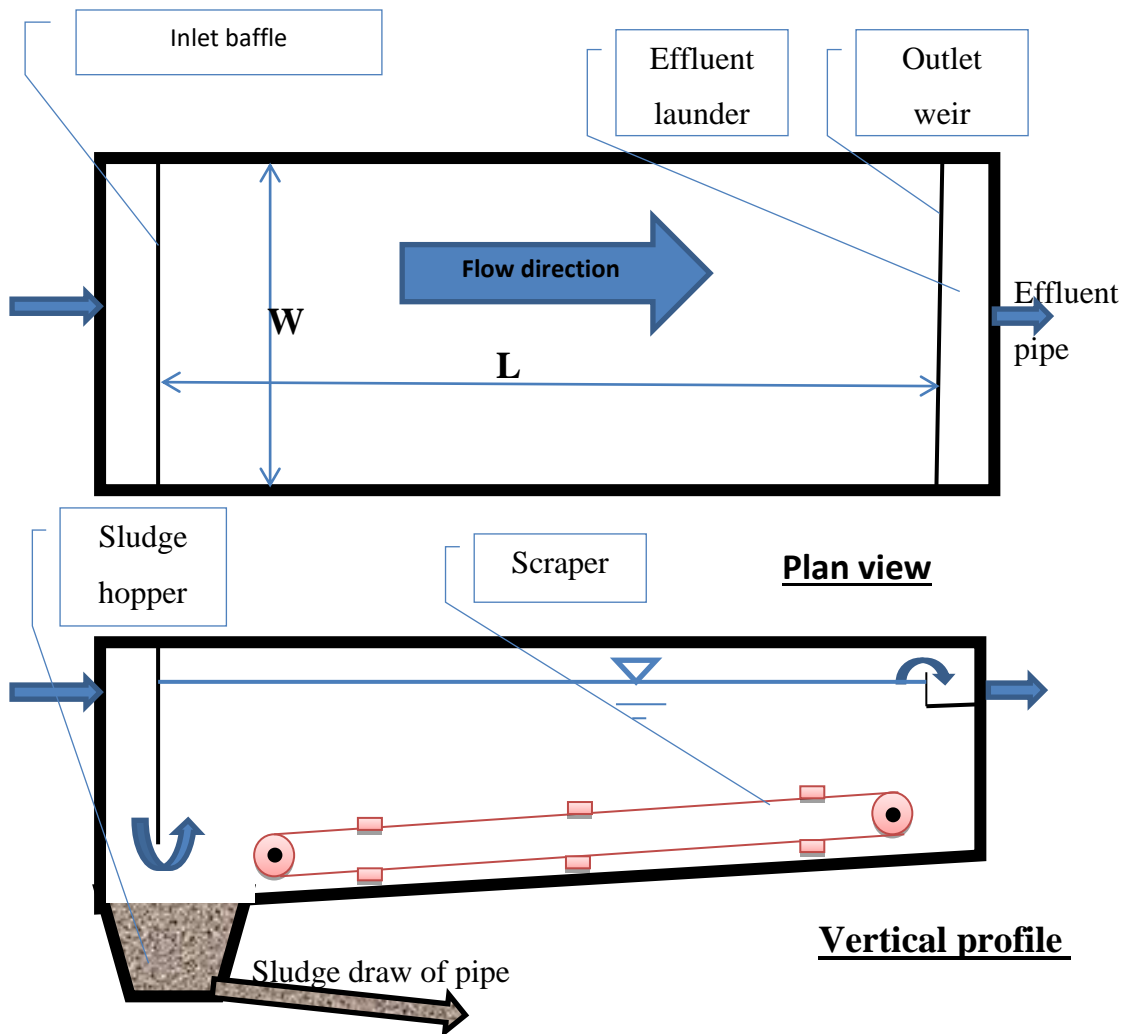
Plan view and profile of a rectangular sedimentation tank
